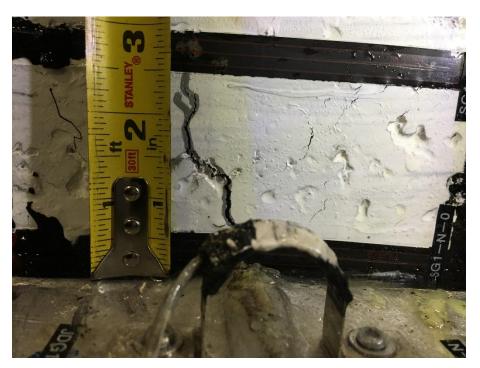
Bottom-up crack at SG1-N-0 2.5 inch long
